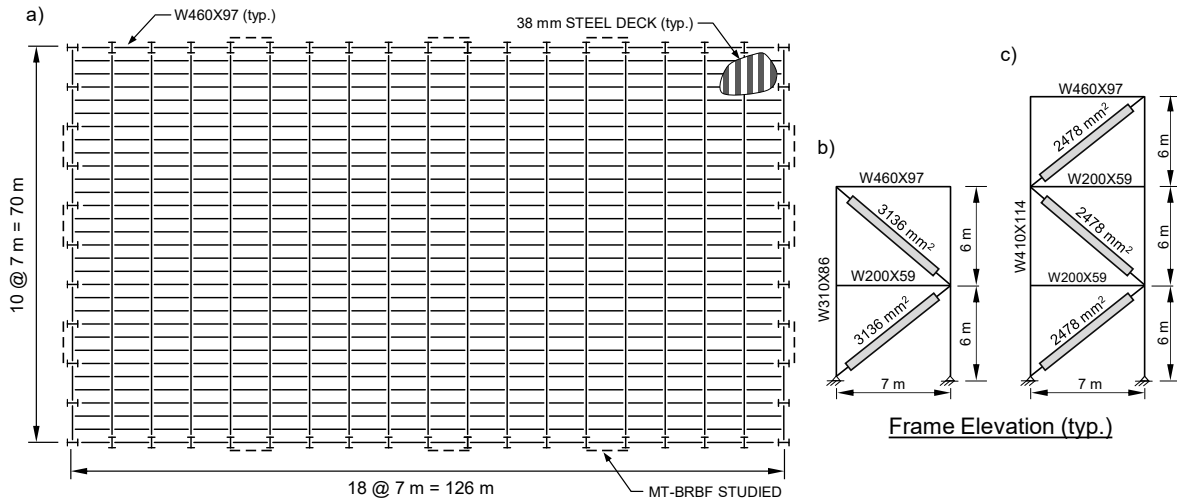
a) Plan view of the selected building; b) two-tiered BRBF elevation; c) three-tiered BRBF elevation
